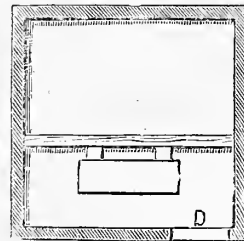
GROUND PLAN OF SMOKE HOUSE.
